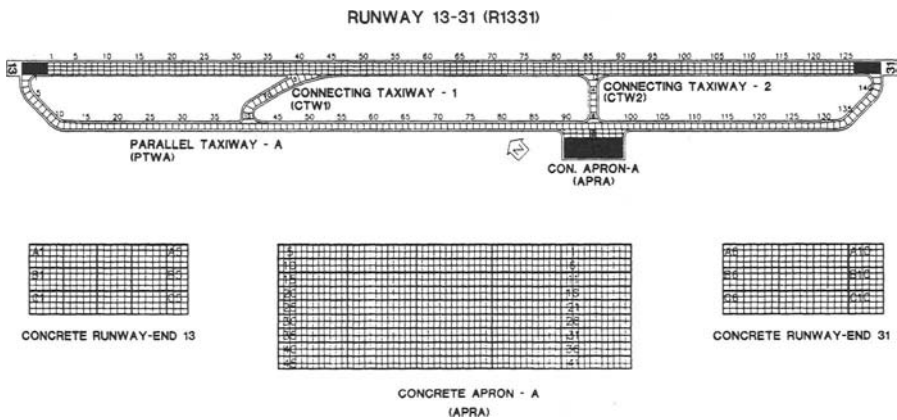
Example Airfield Pavement Network Divided into Sample Units. (From ERI Consulting Reports 1984)
